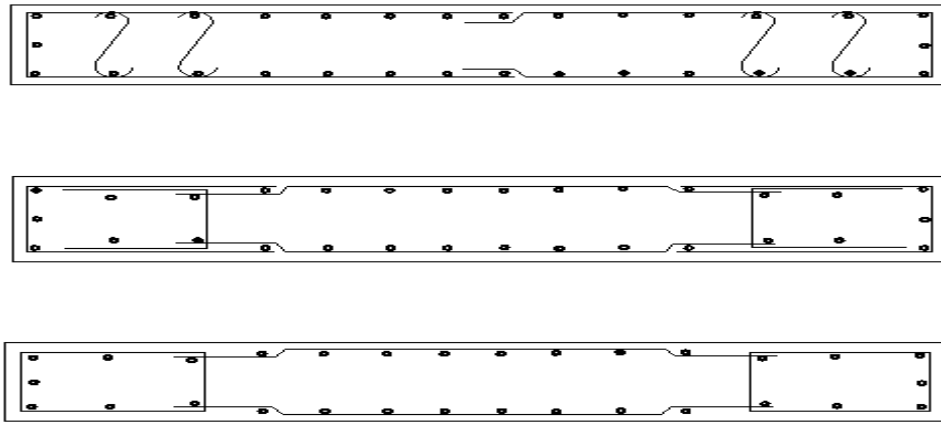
Best ways of how to reinforce a shear wall [4]
